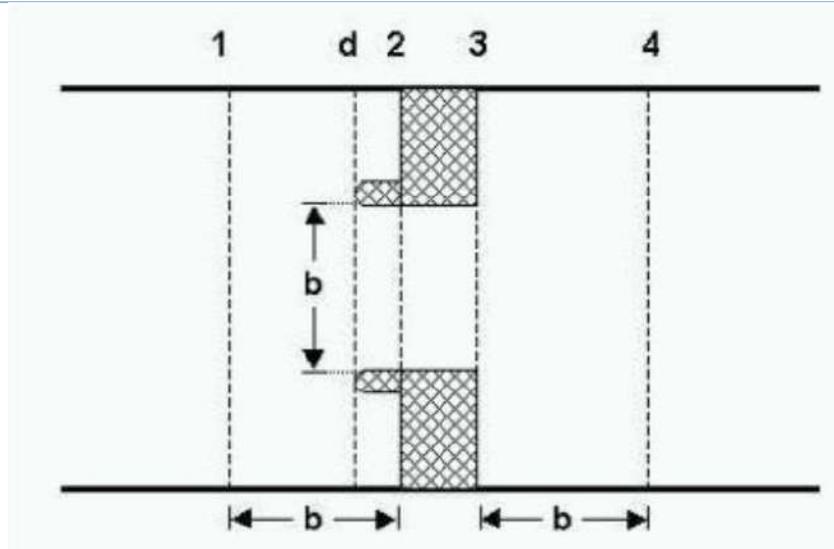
Location of cross sections for FHWA WSPRO bridge method (M11 reference manual)
